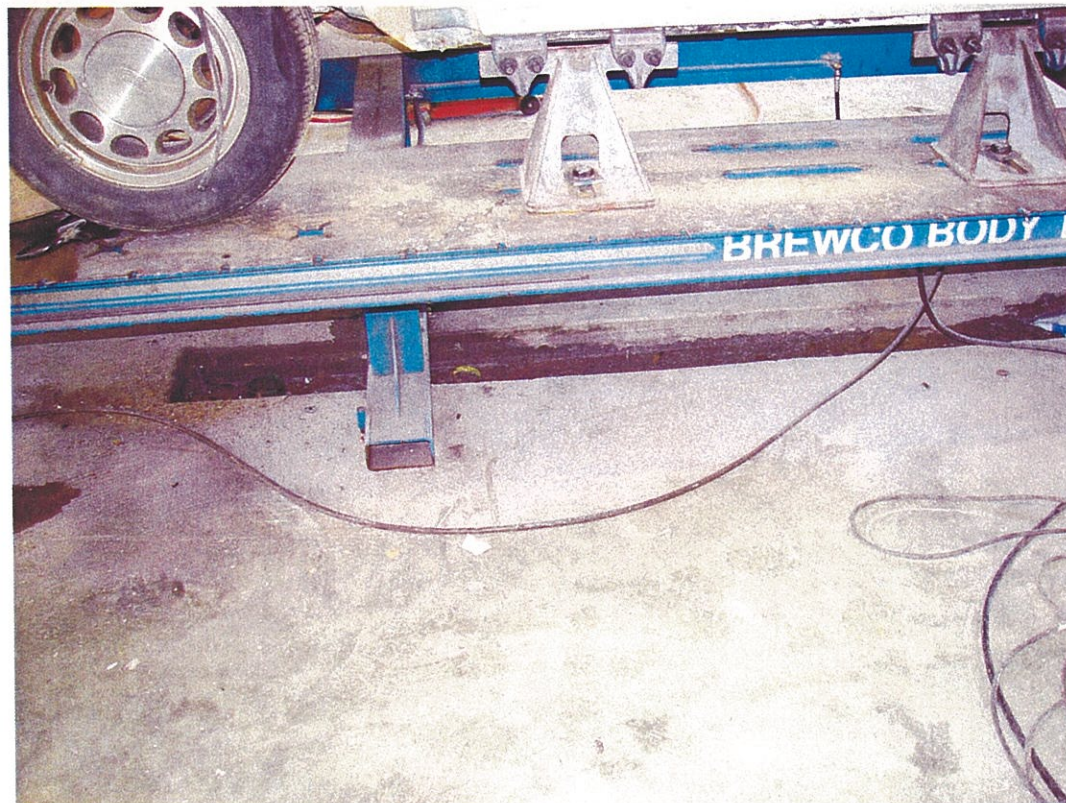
View looking at the trench drains located in the auto repair building on the Turner property.
